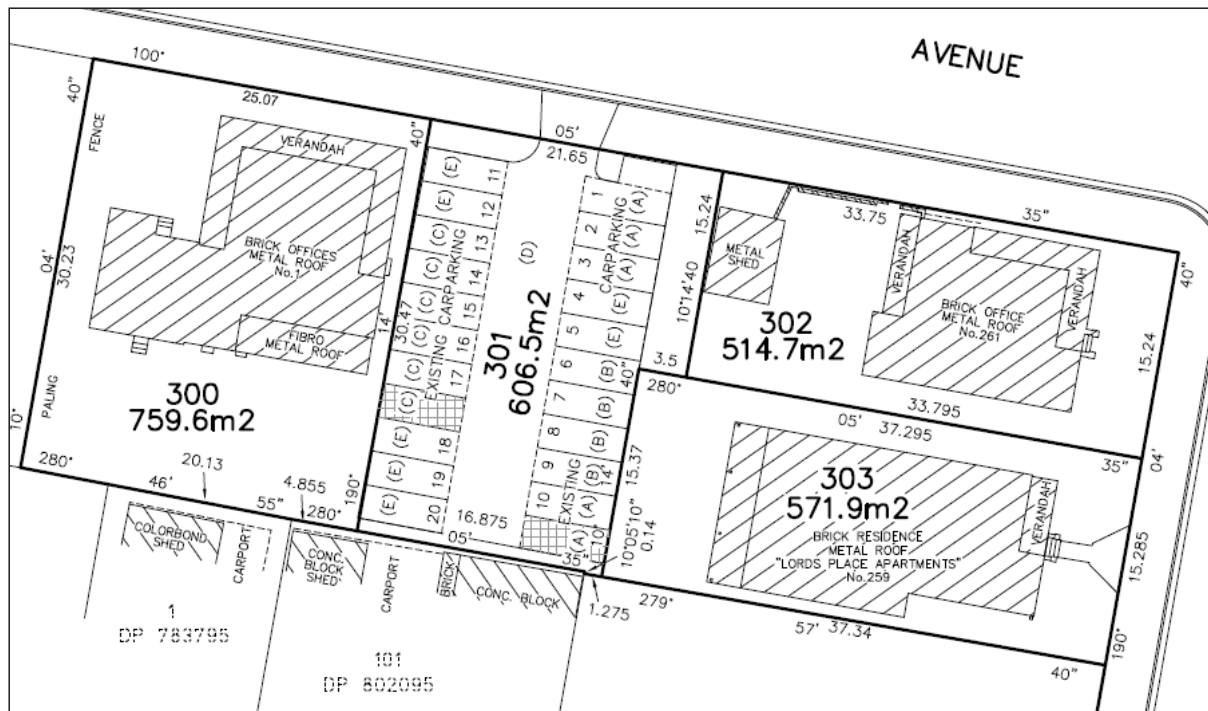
proposed boundary adjustment to create consolidated car park site – Lot 301
